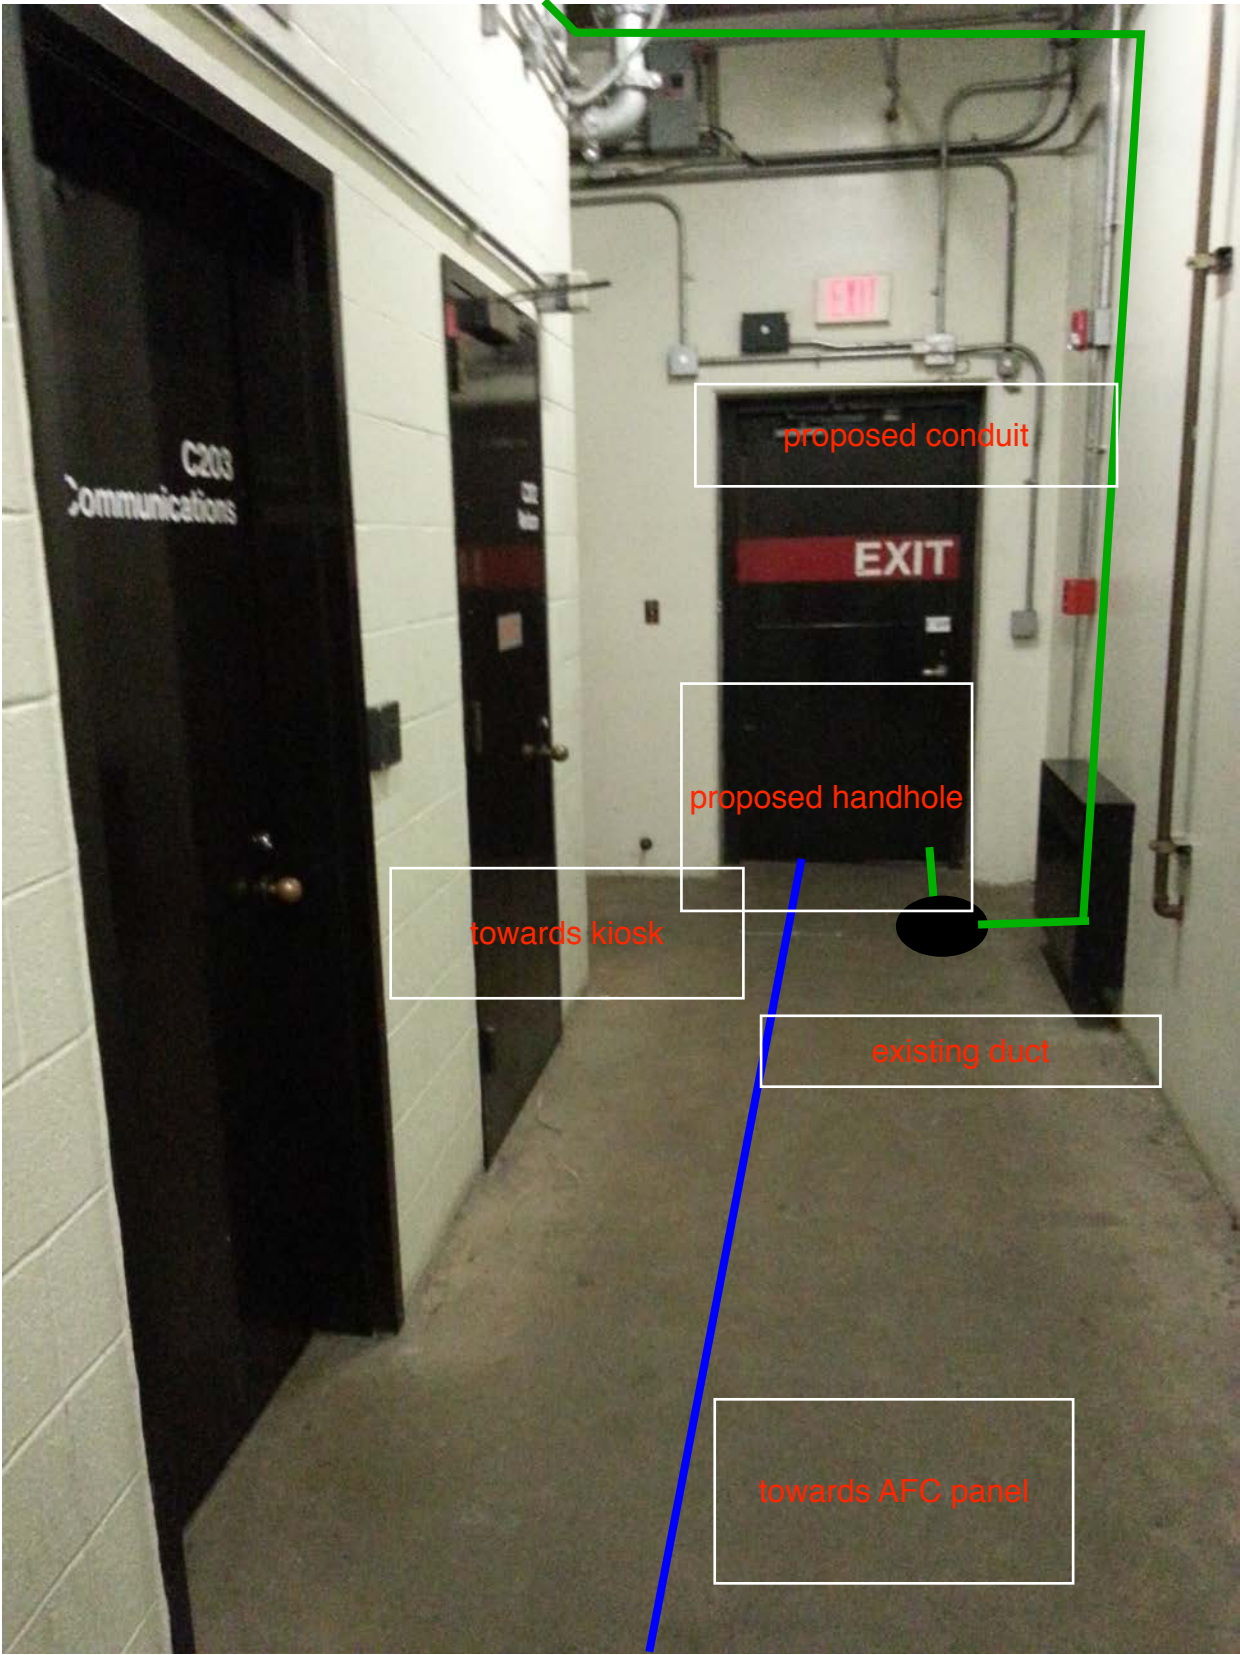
C13 King Street South: Existing duct and proposed conduit drop in floor to lower level towards AFC panel
